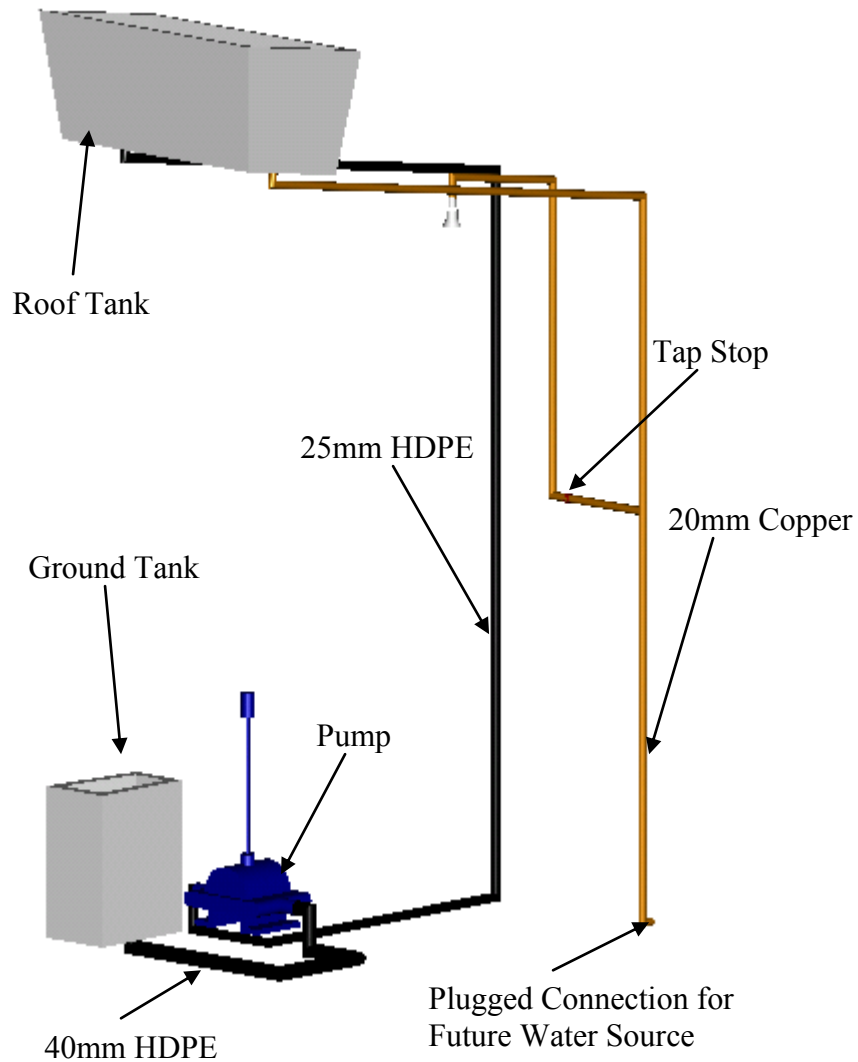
Dry toilet facility design with ROCLA structure hidden to reveal cast piping
